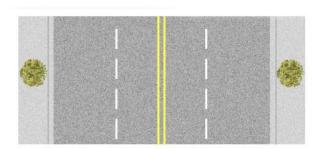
continued*Standard MPAH Cross Sections
